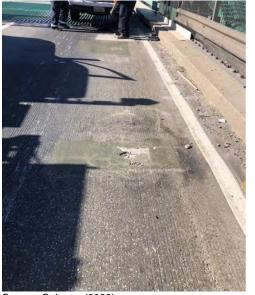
Bridge Deck Concrete Spalling
